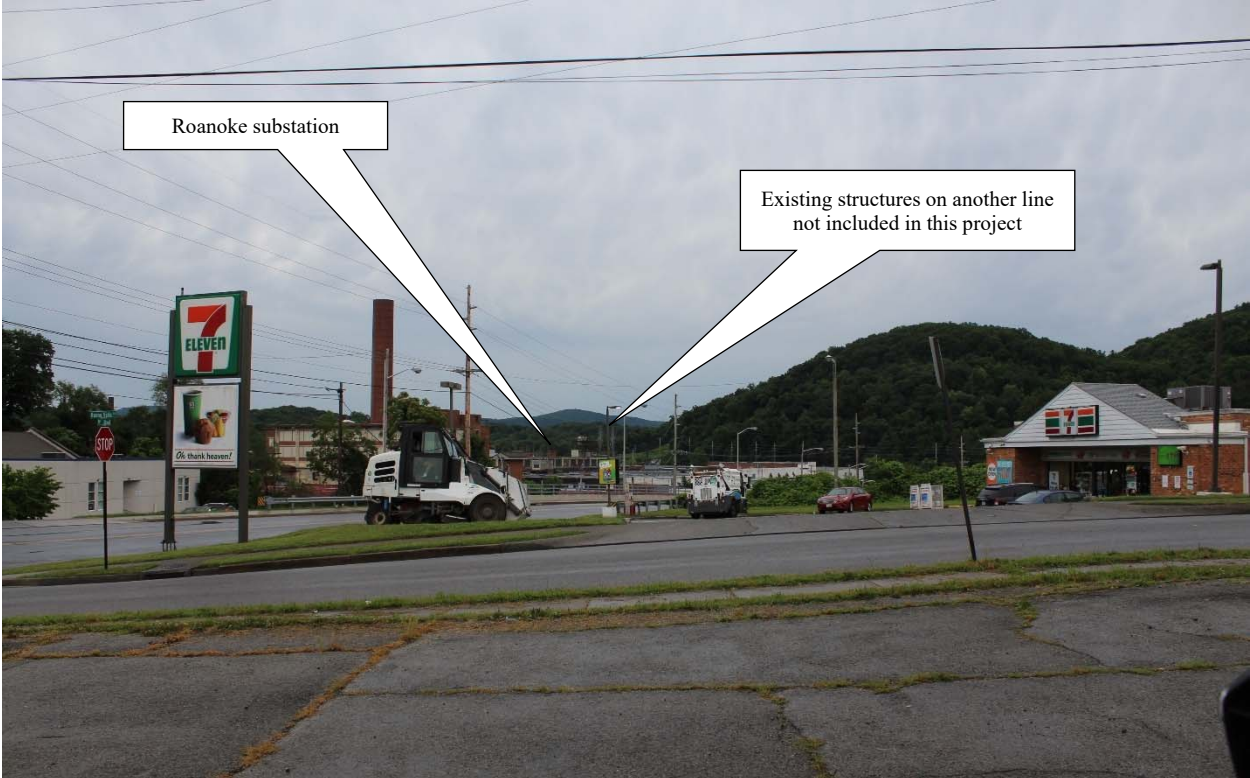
Photo location 4- View from edge of residential area along Buena Vista Boulevard towards the Project (Roanoke substation visible in conjunction with other structures not included in this project), facing south.
